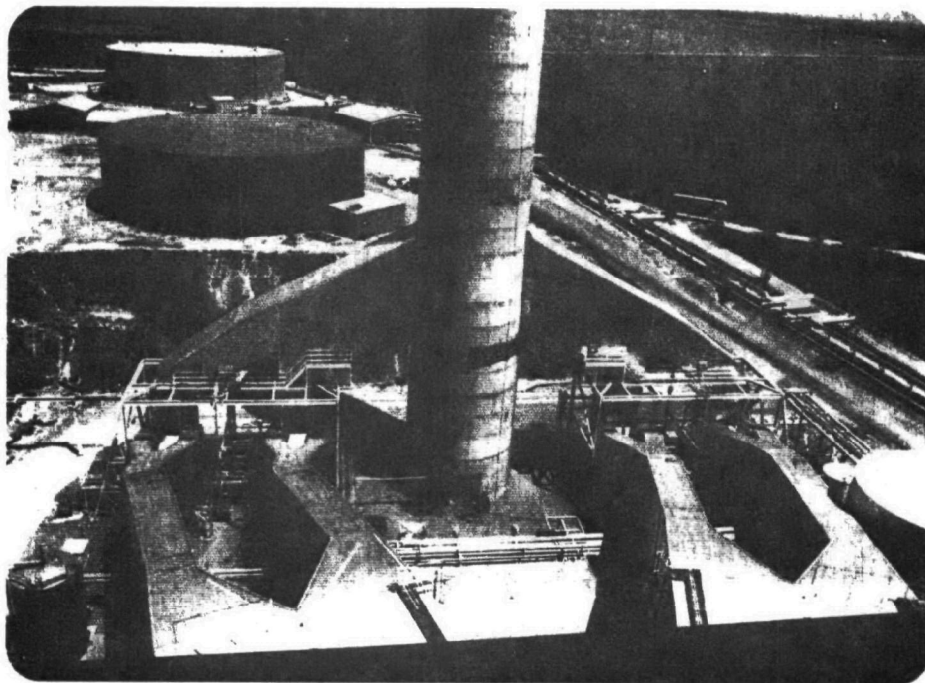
View from the roof of Boiler 5 facing north showing Boiler 5 duct tie-ins to the stack. Oil storage tanks are shown in the background.
